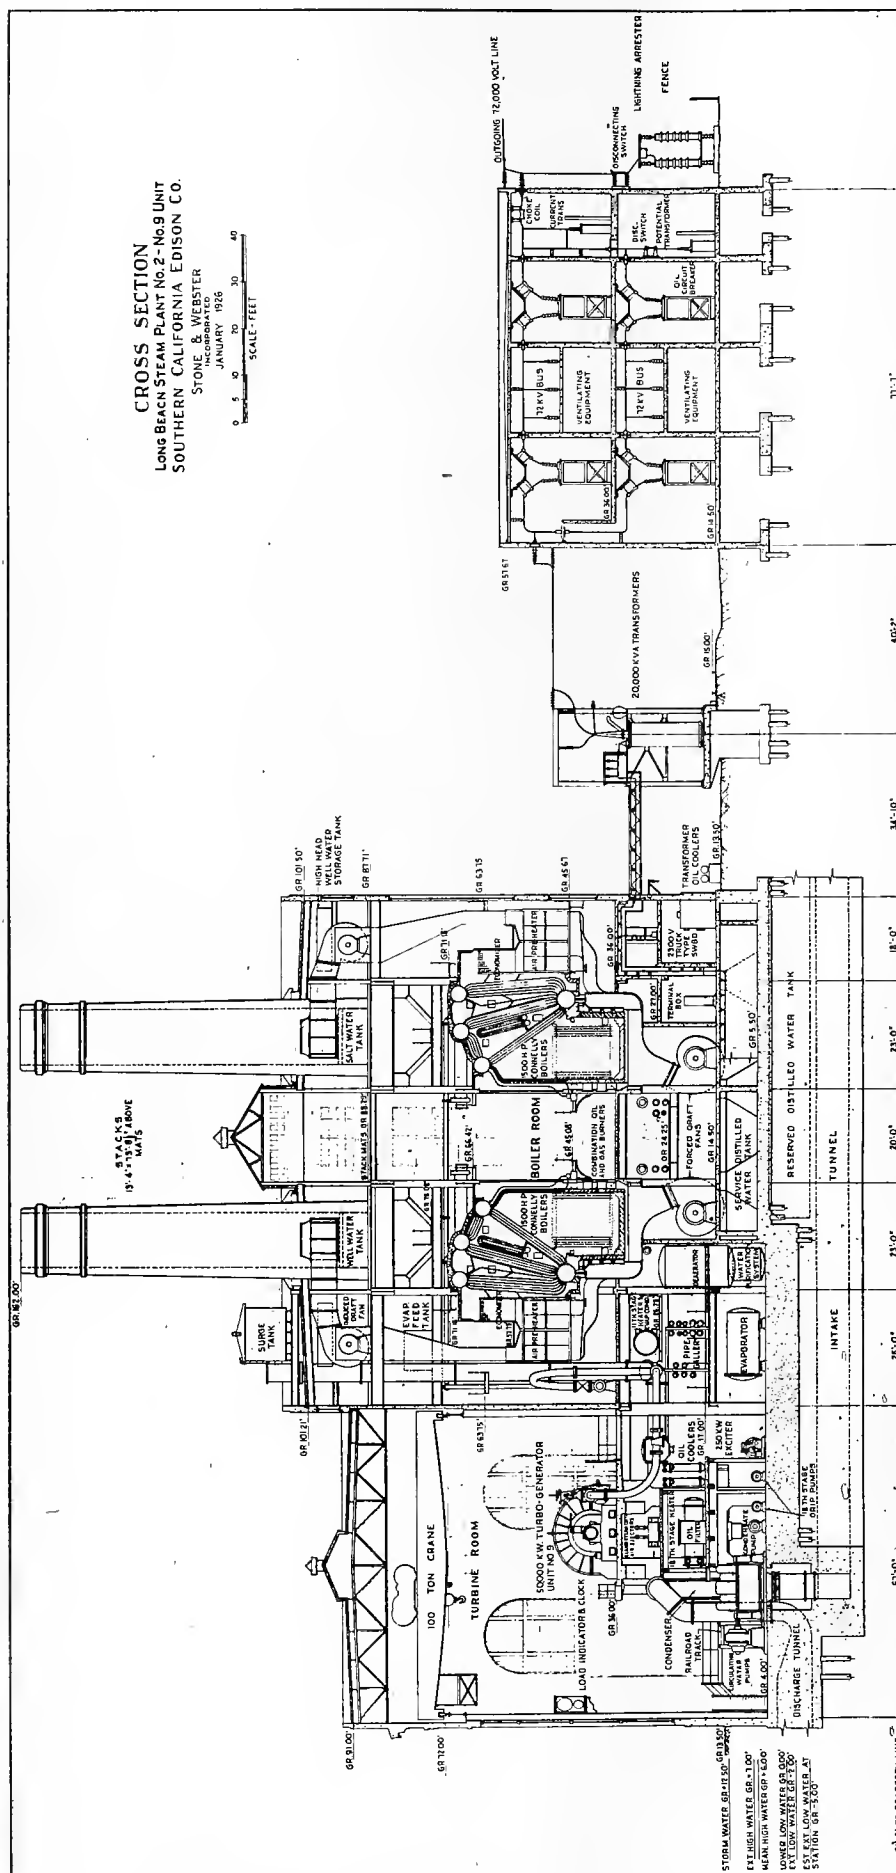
Sectional elevation showing No. 9 unit, Long Beach plant.
